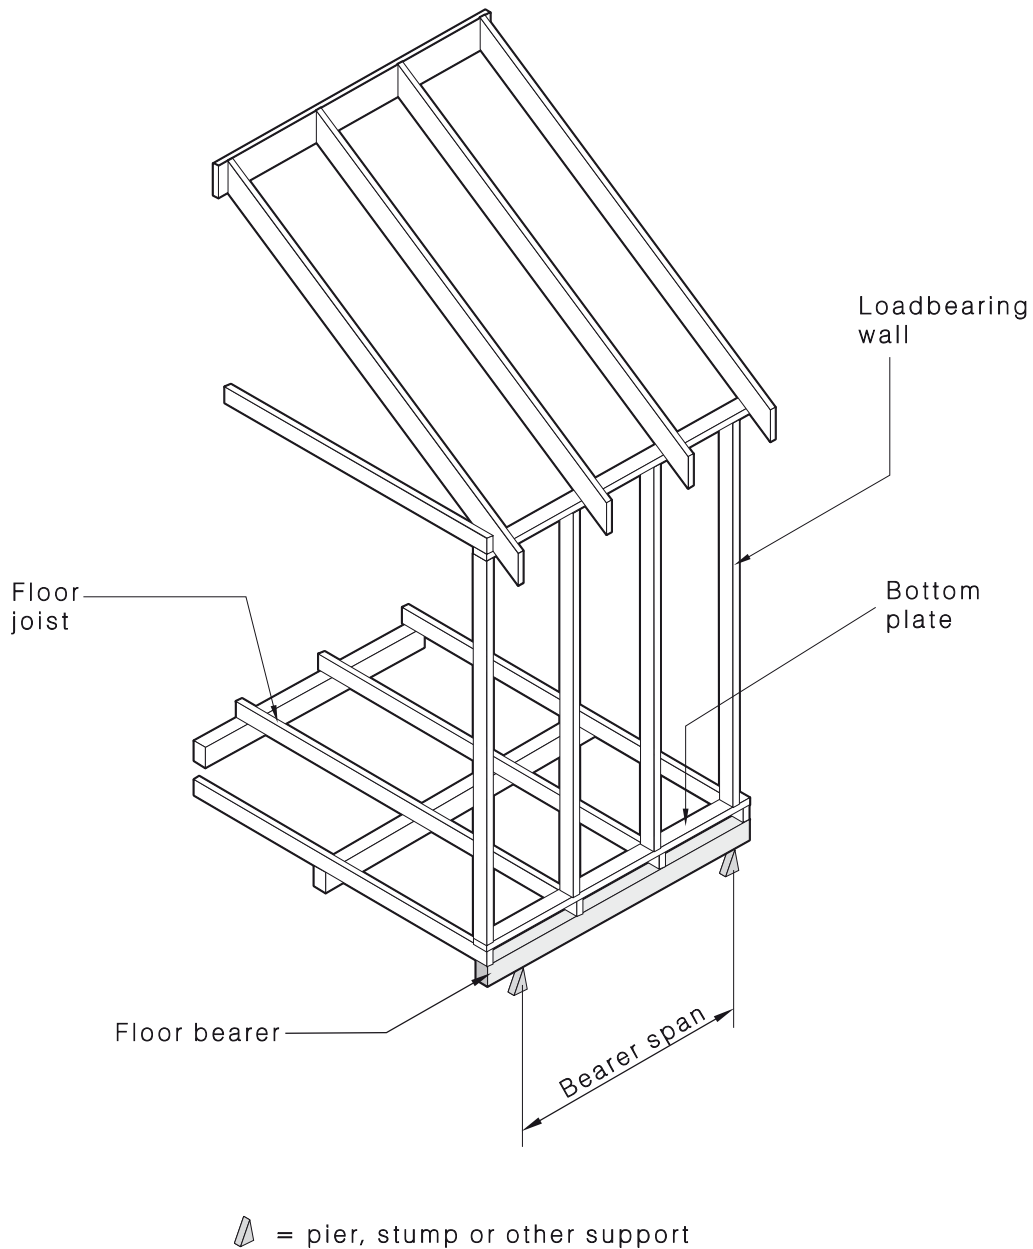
BEARERS SUPPORTING LOADBEARING WALLS—
